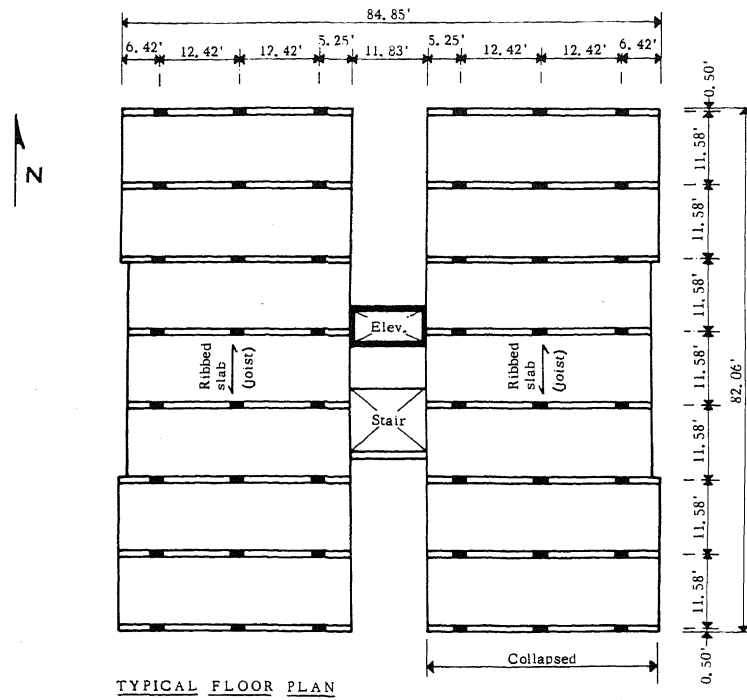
(a). Palace Corvin Building Typical Floor Plan.
